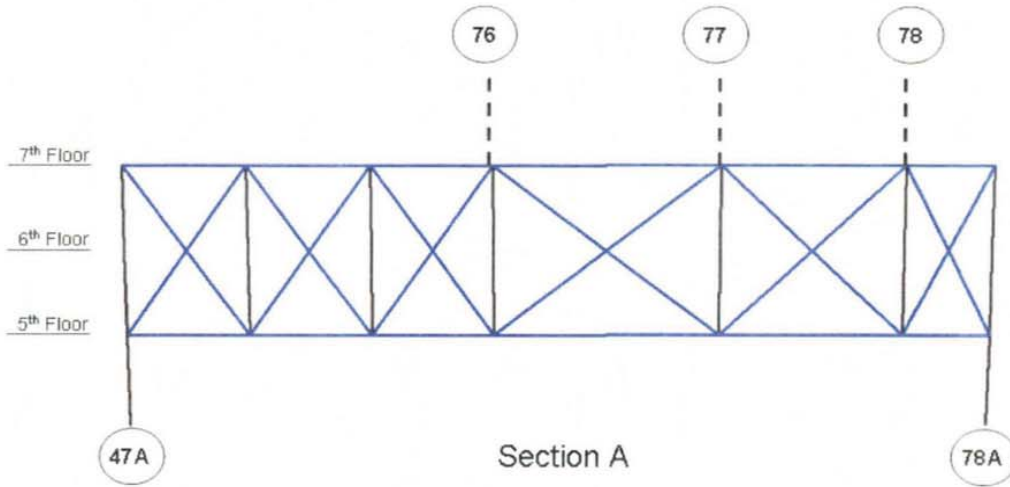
Elevation of proposed truss (Section A) as seen in Figure 5.16
